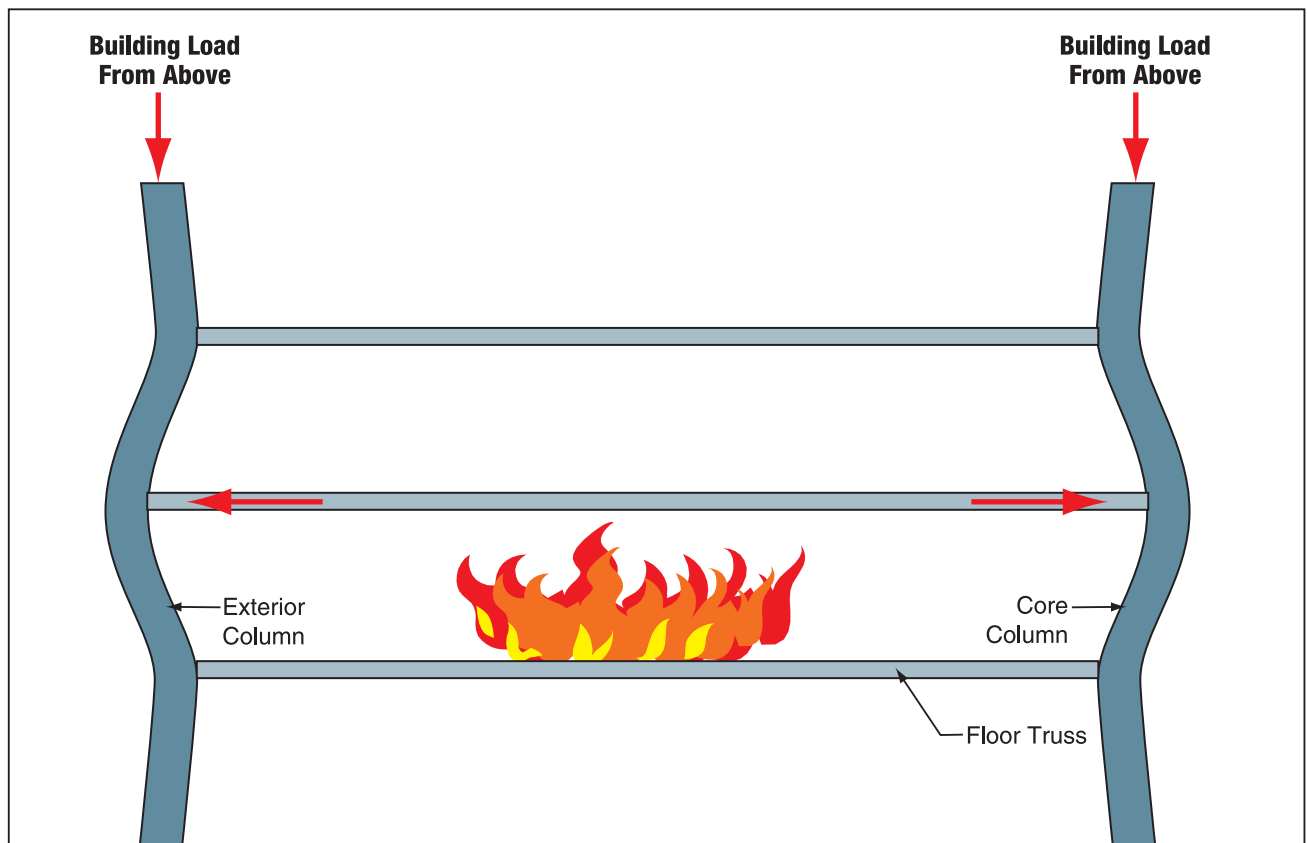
Expansion of floor slabs and framing results in outward deflection of columns and potential overload.
